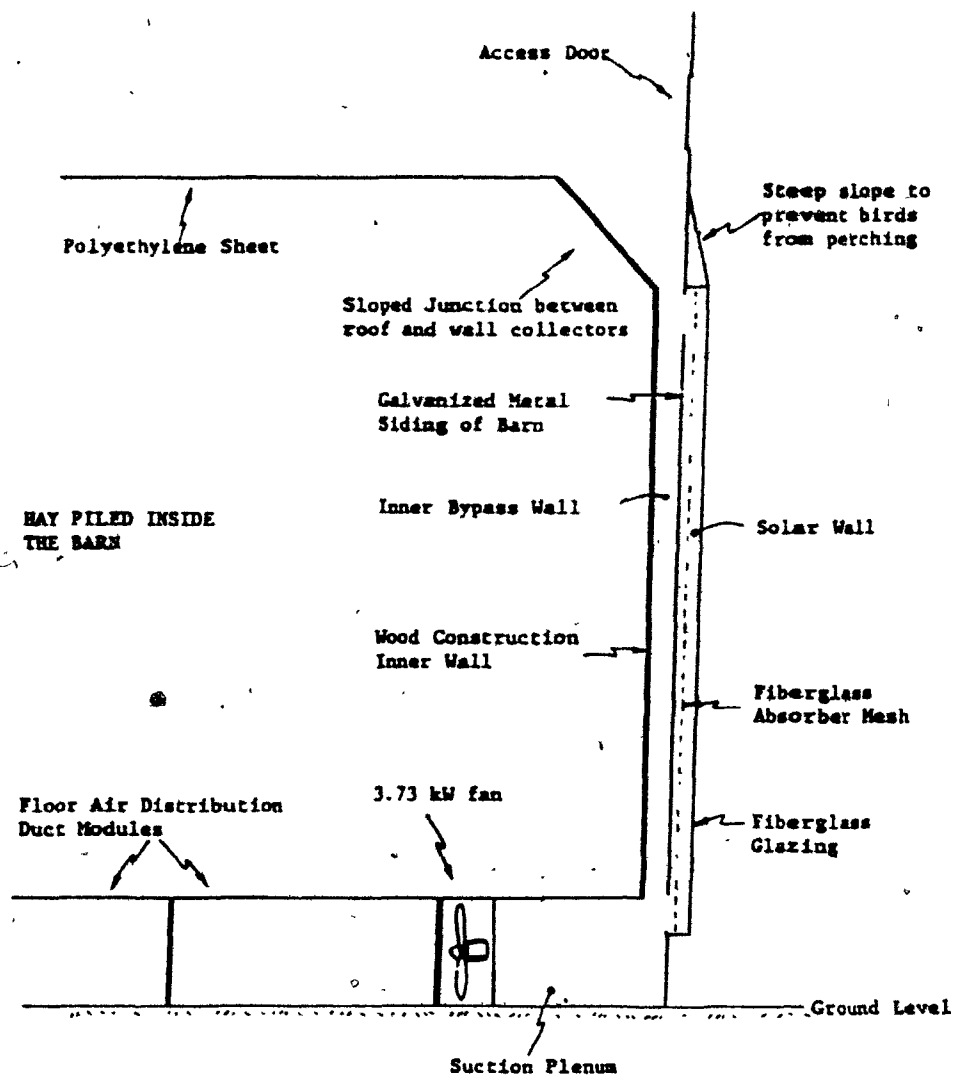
Section View through South Wall of the Barn, showing Solar Wall and Other System Components (not to scale).
